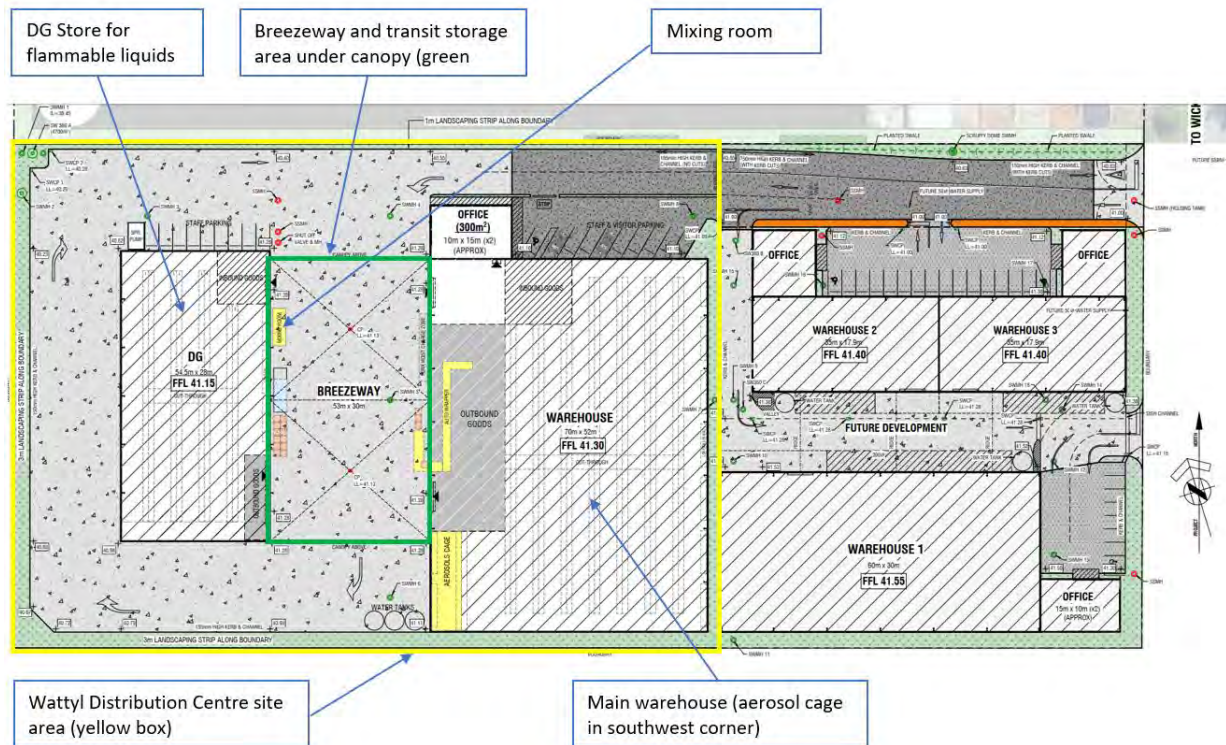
Proposed site plan showing locations (source: Tokin and Taylor Ltd assessment)
